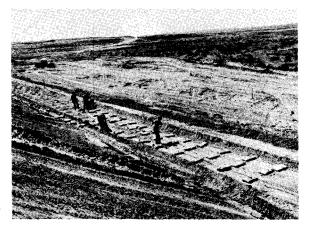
Dumping of portland cement from sacks which had been spaced to provide the required percentage of cement for the soil-cement, Bonny Test Section. Photo P794-701-549
